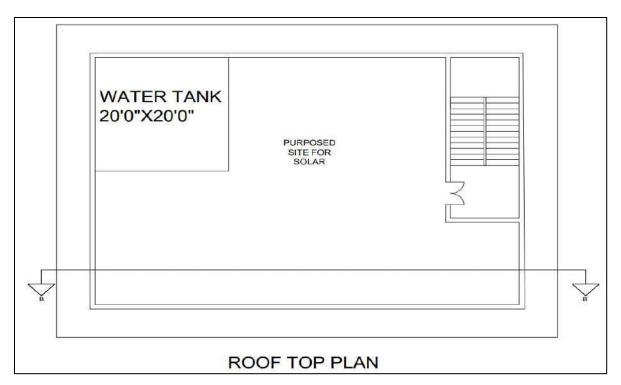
Hostel top view - Roof top (AutoCad 2022)
